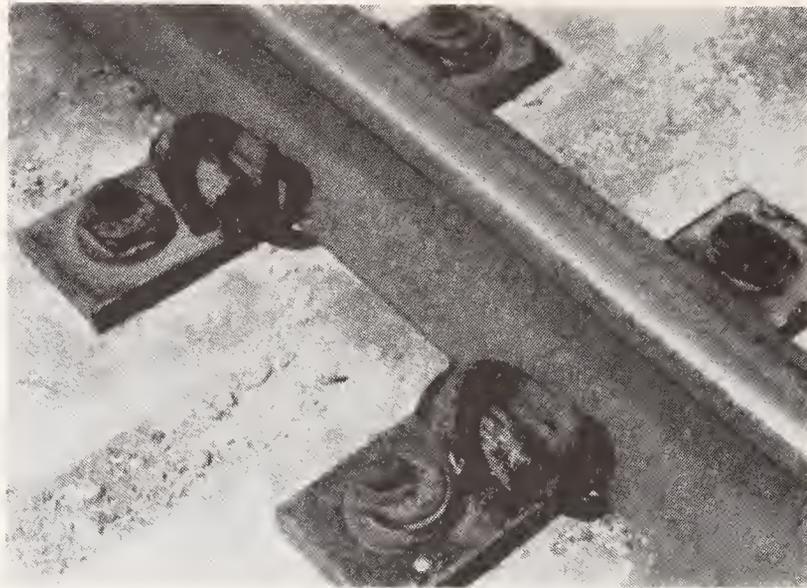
SEPTA INSTALLATION OF LANDIS-PANDROL ON ELEVATED DECK
